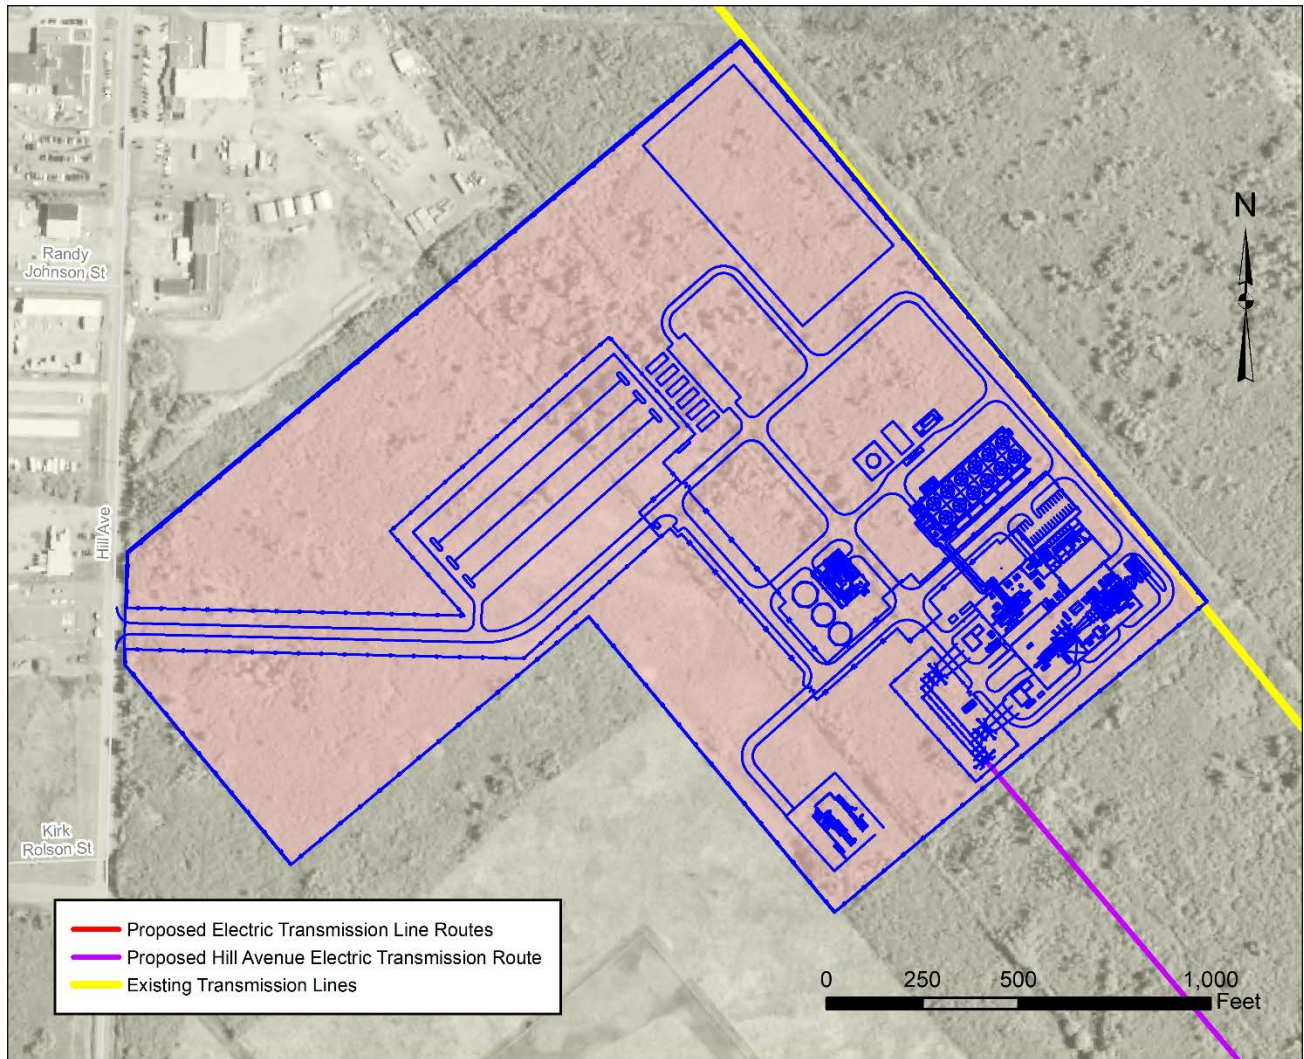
Proposed infrastructure layout for the Hill Avenue Site
